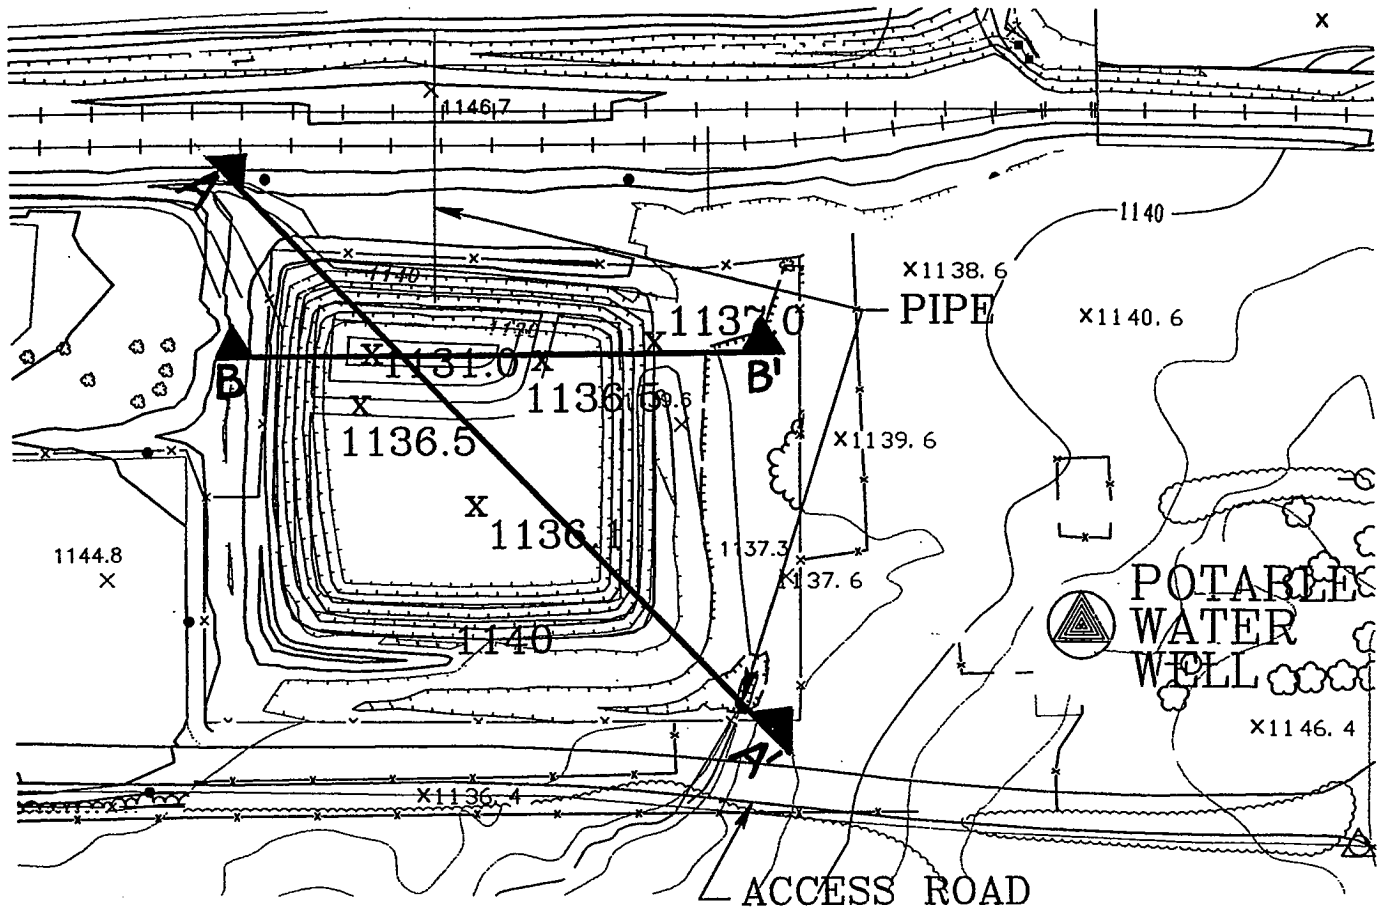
Detail Plan and Typical Section through the Surge Pond Biofilter in Industrial Outlot Watershed (Not to scale).
